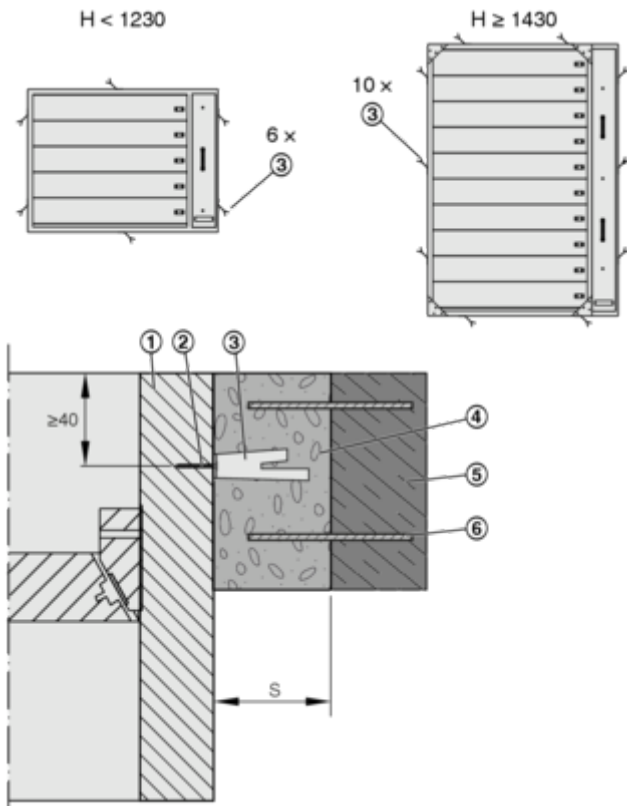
EK-JZ mortar-based installation with wall fixing tabs
